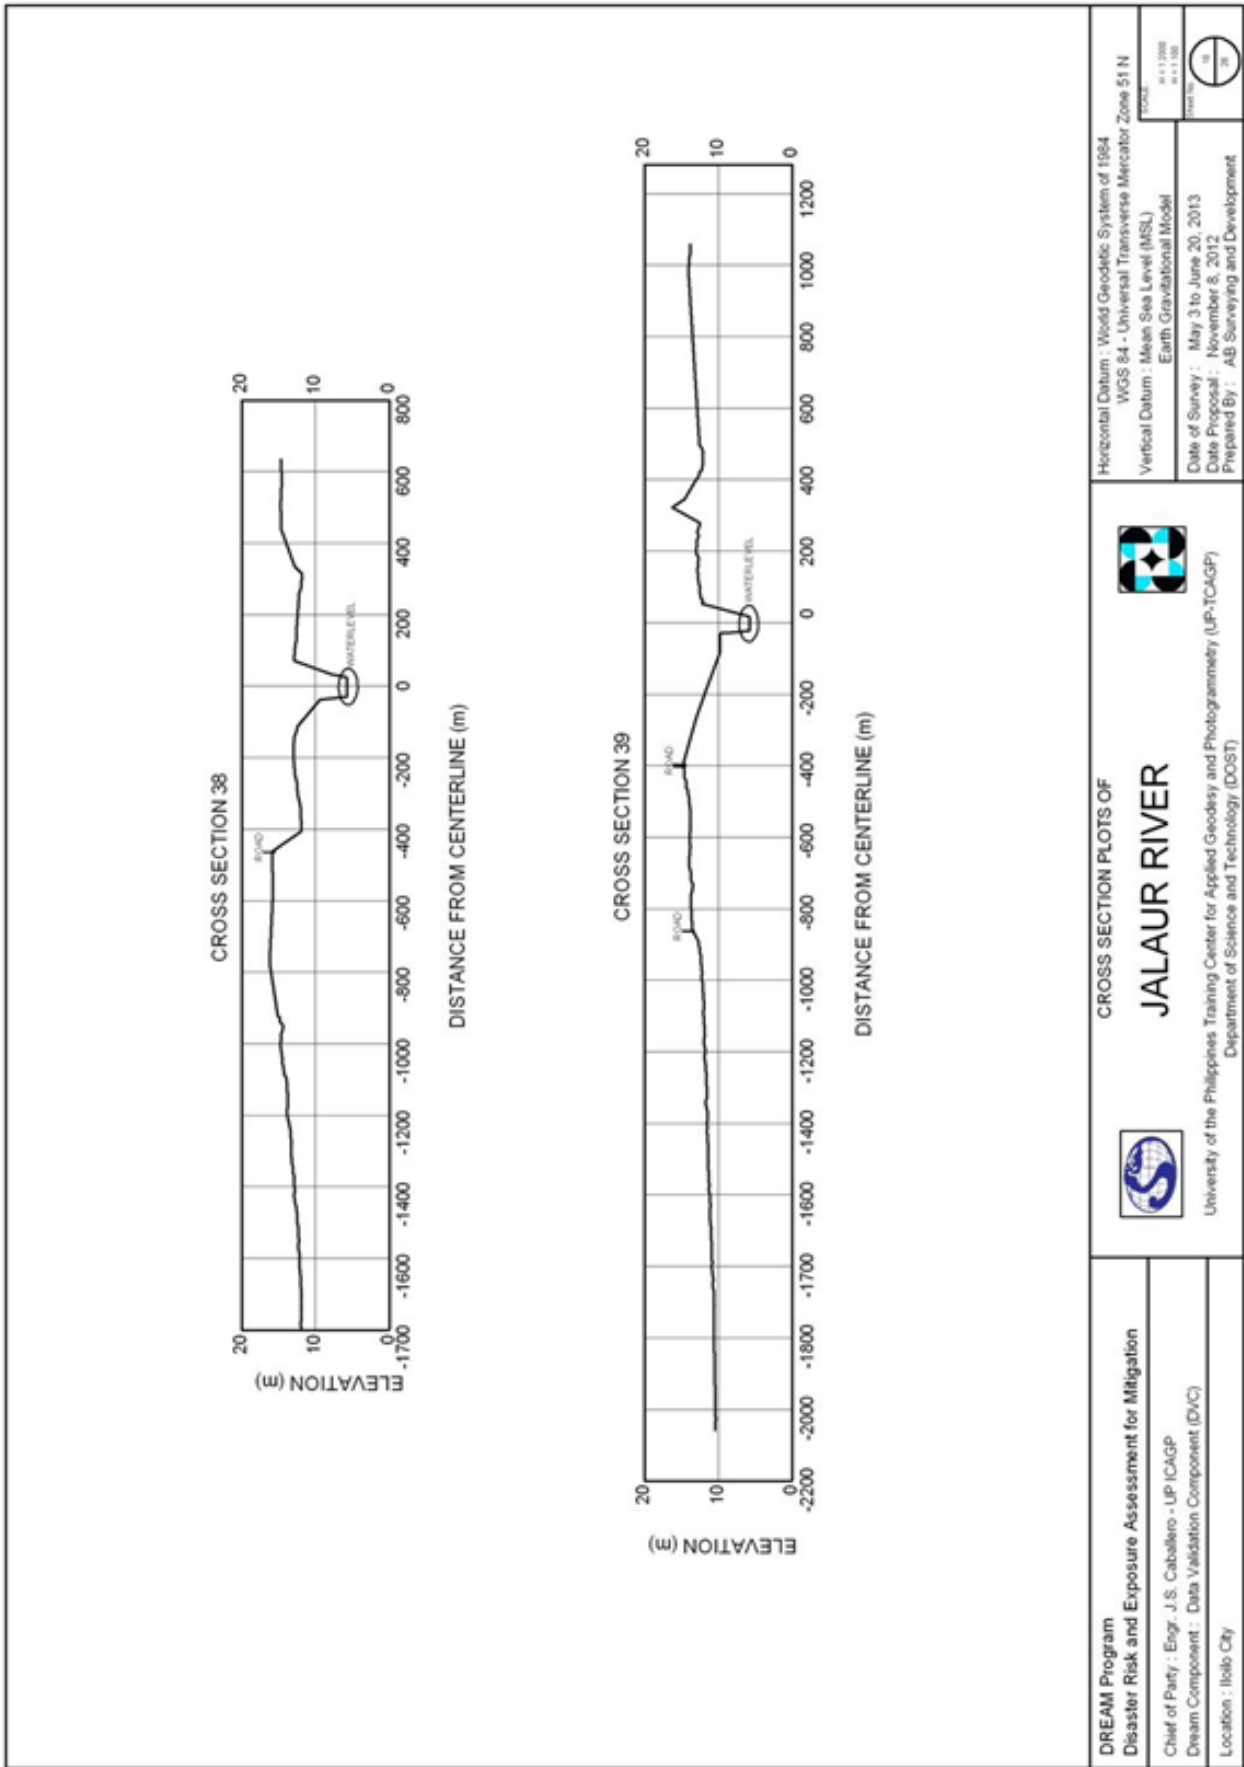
Sheet No.18 of the Cross-section plan of Jalaur River
